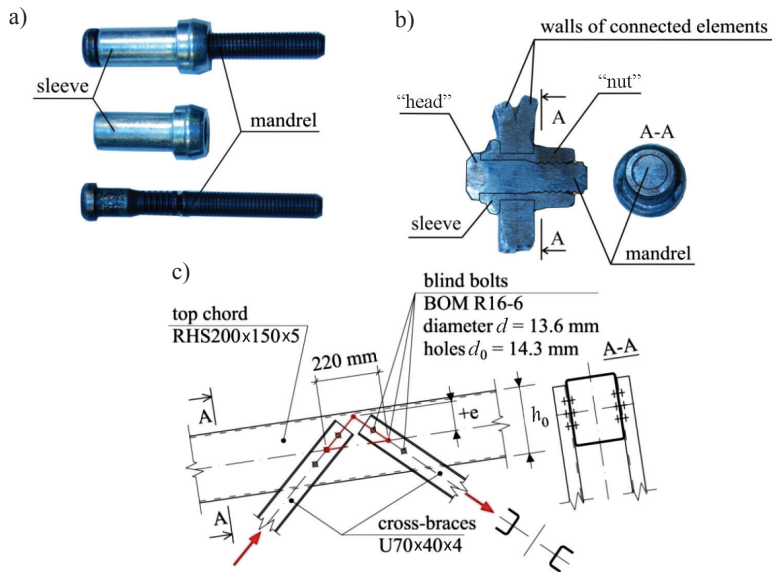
Single-cut joints with BOM blind fasteners [18–20]: a) BOM R16-6 fastener, b) cross-section of the fastener after installation, c) structure of the truss joint
